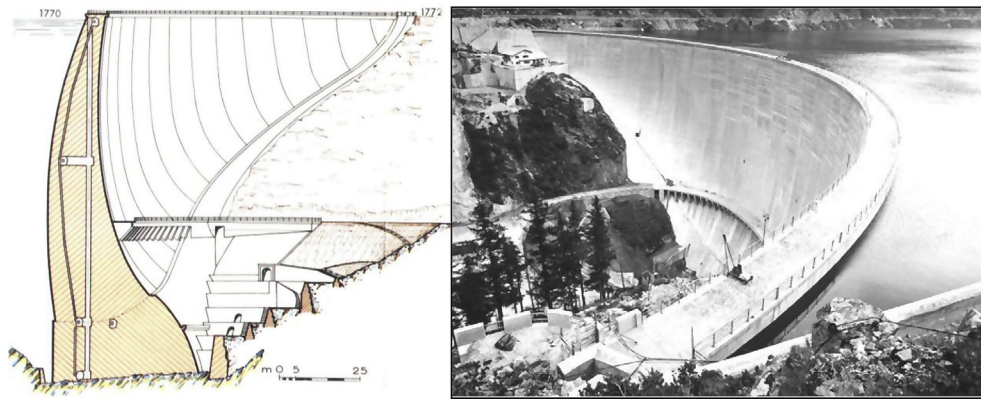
Cross-section of the Beauregard Dam (left) and a view of the reservoir in 1962 (right) (Anidel, 1952a, 1961a).
